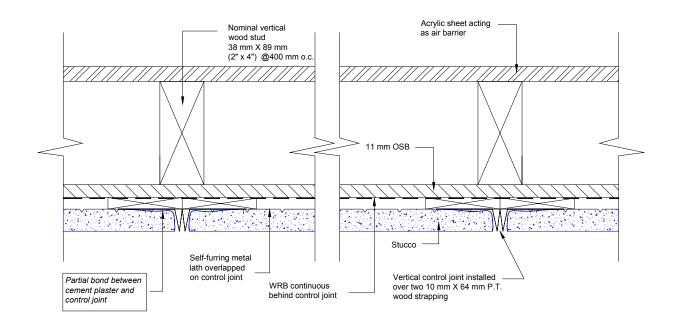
Vertical control joints for specimen No. 5- Horizontal section
